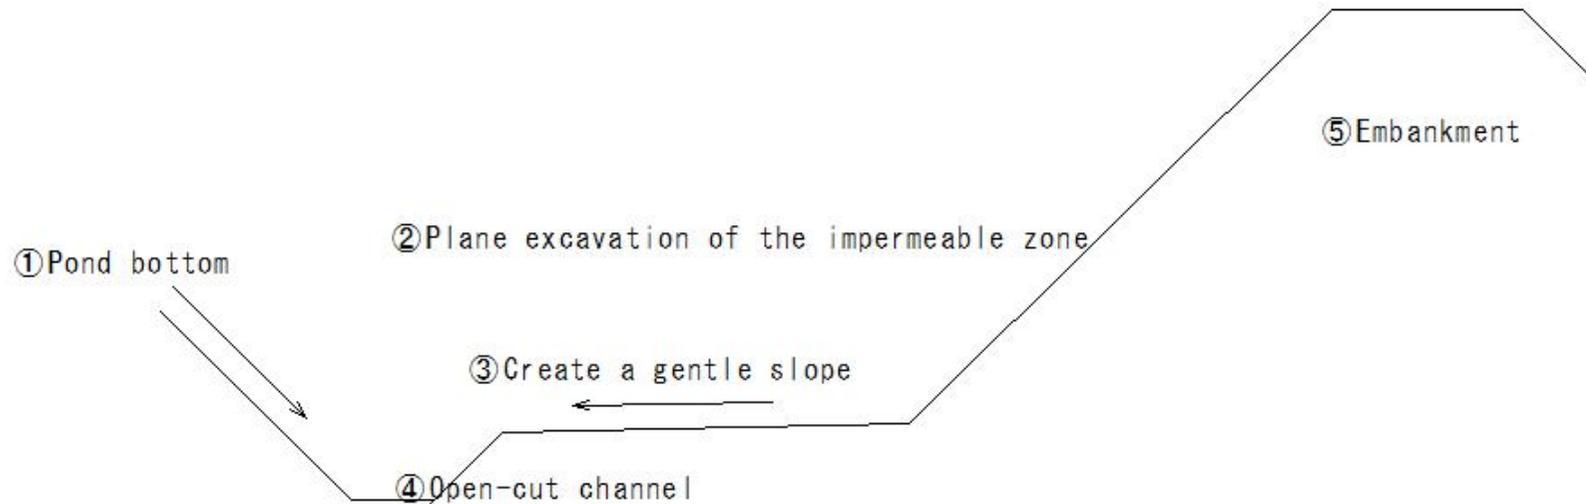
Drainage of the impermeable zone floor excavation
